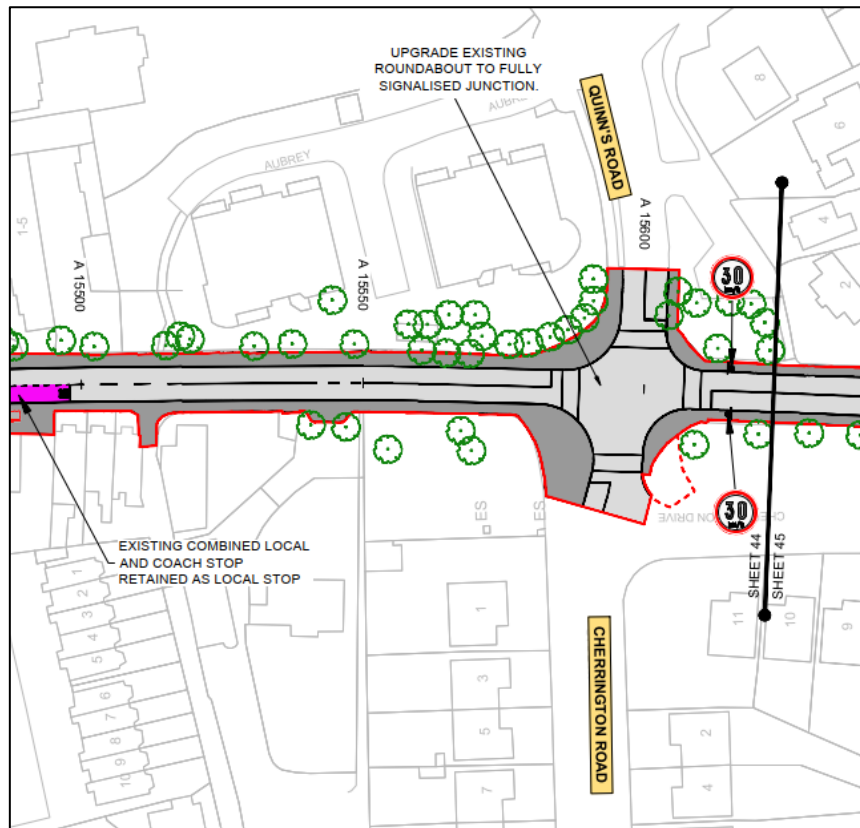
Extract from General Arrangement Drawing at Dublin Road/ Quinns Roundabout (Sheet 44)
